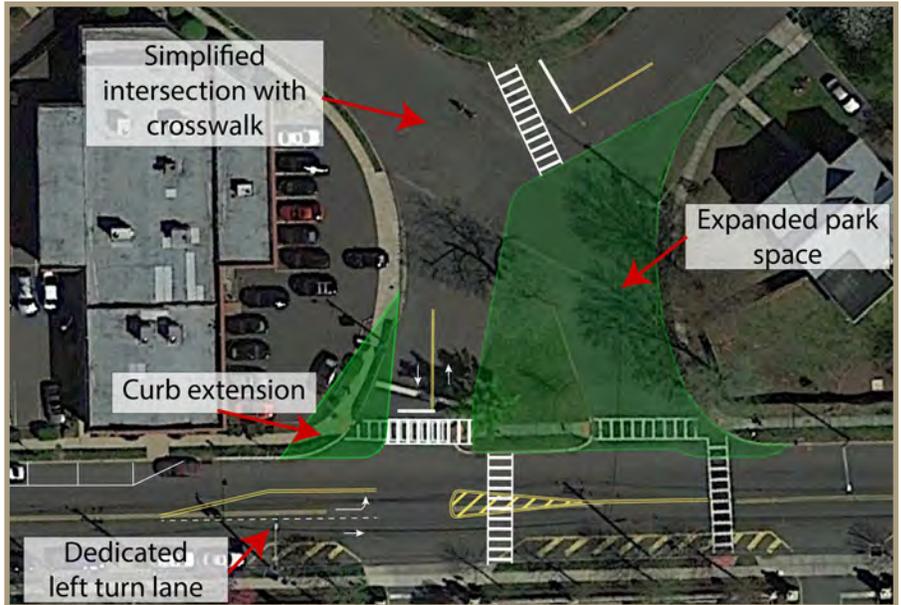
Potential modifications to add a park and simplify traffic at North Avenue, St. Paul Street, and Tremont Avenue.
